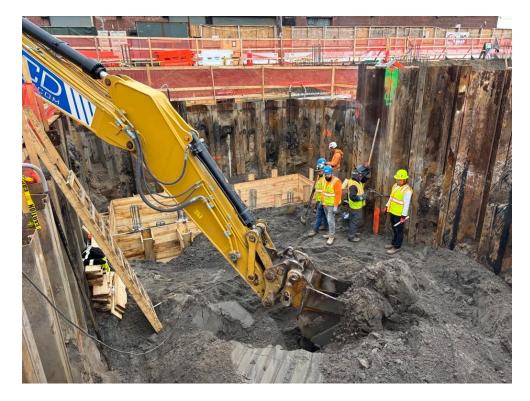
ECD excavating non-native fill in the western part of the site (facing east)
